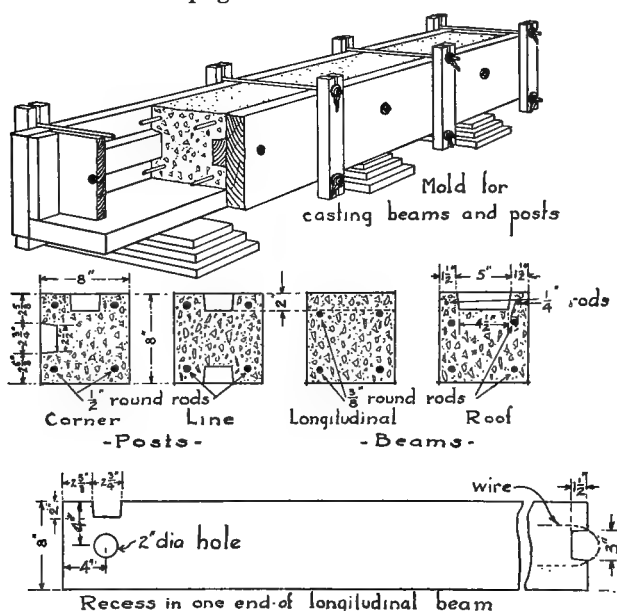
Post and Beam Mold, cross sectional views of posts and beams for slab shelter house, and plan of a longitudinal beam.
